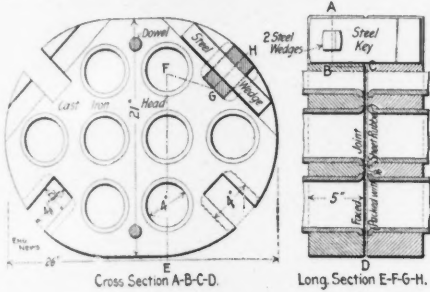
Coupling Plates at Ends of Sections and Bolts Used in Clamping Together.
